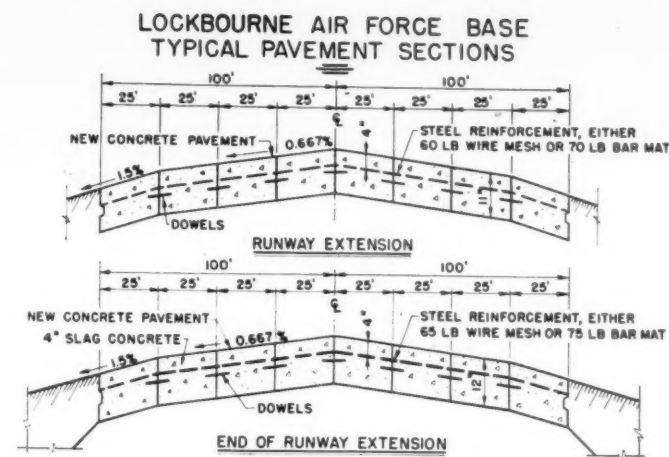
Pavement sections through the extension of the northeast end of the runway.
